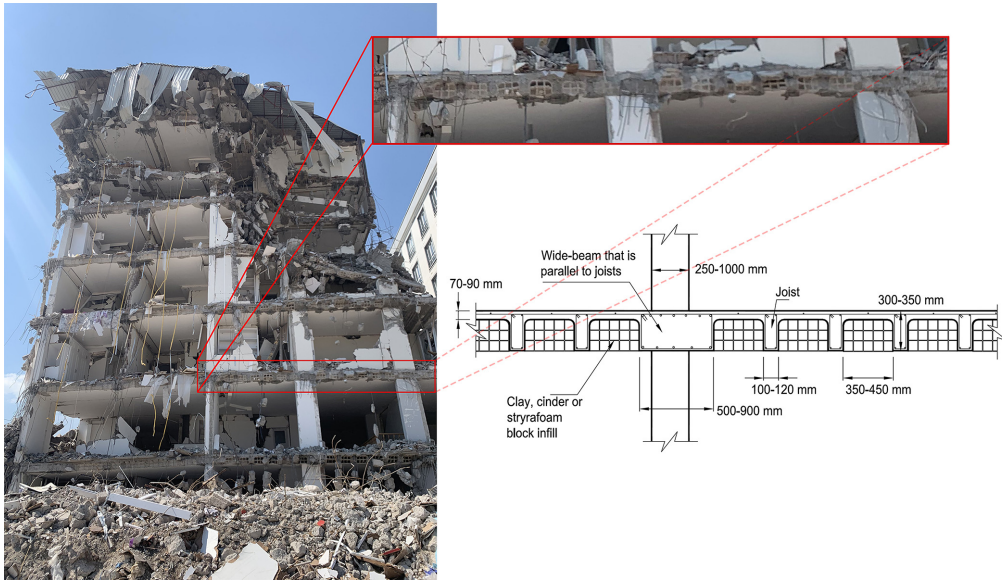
Partially demolished reinforced concrete frame with shallow beams and typical dimensions of one-way joist-slab shallow-beam frames in Turkey.
